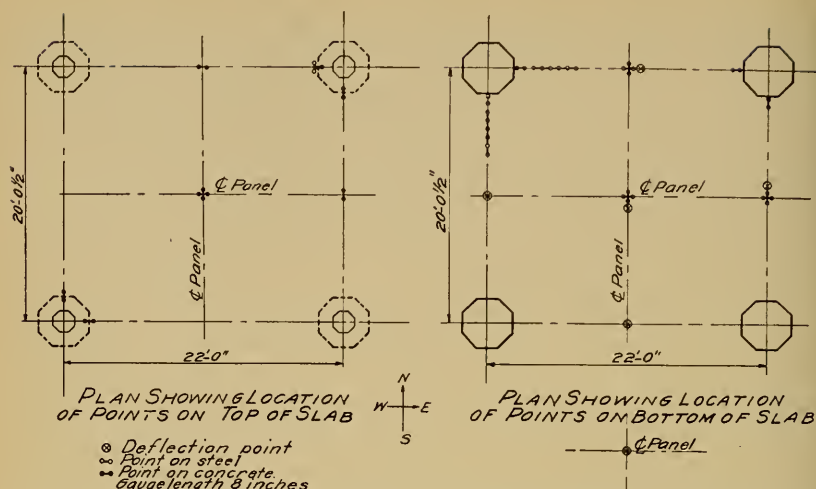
CARLETON BUILDING TEST; PLAN SHOWING POSITION OF GAUGE LINES.
